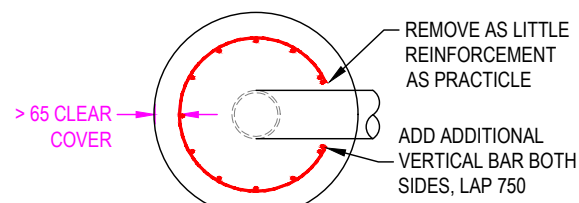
D: BASE PILE (PLAN SECTION D)
